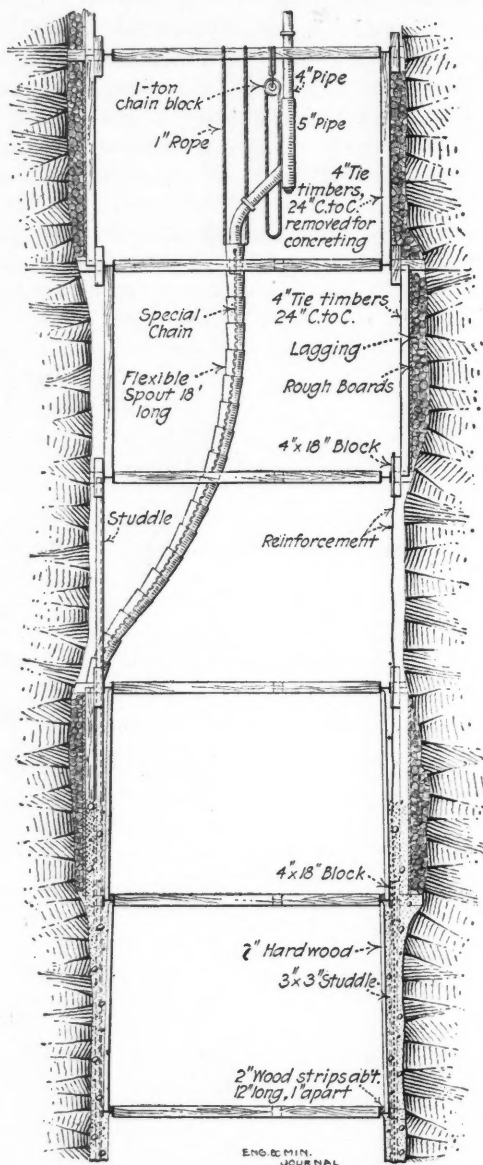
VERTICAL SECTION OF SHAFT, SHOWING SET AND FORMS AND FLEXIBLE SPOUT
